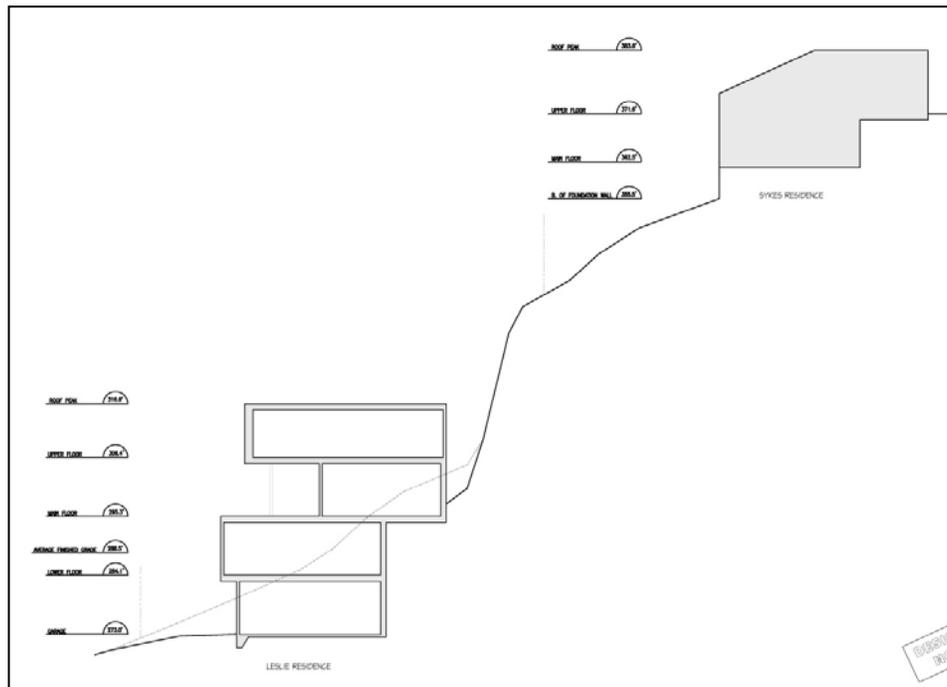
Schematic Lot Section (Sykes Residence at top, proposed new construction below)
